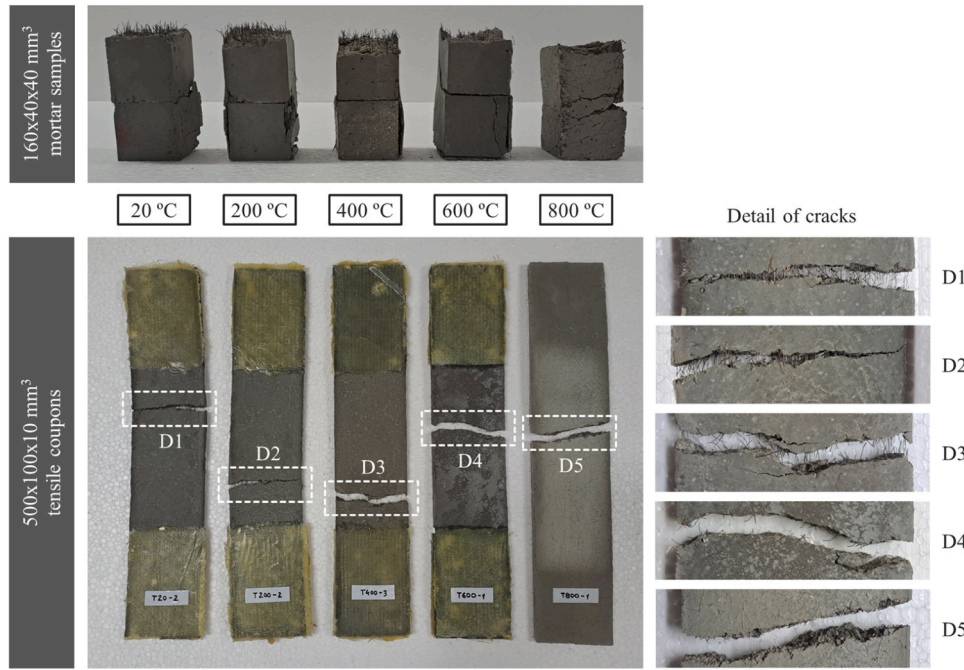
UHPC specimens after destructive tests: 160×40×40 mm³ mortar samples and 500×100×10 mm³ tensile coupons.
